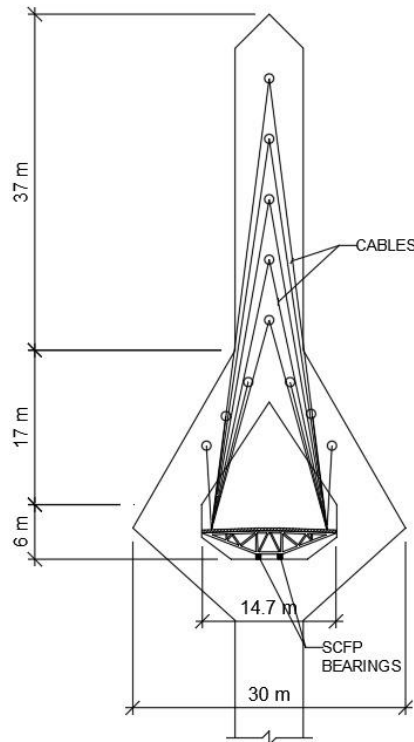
Cross section of the bridge section and layout of the seismic isolator between the pylon and the stiffening beam
